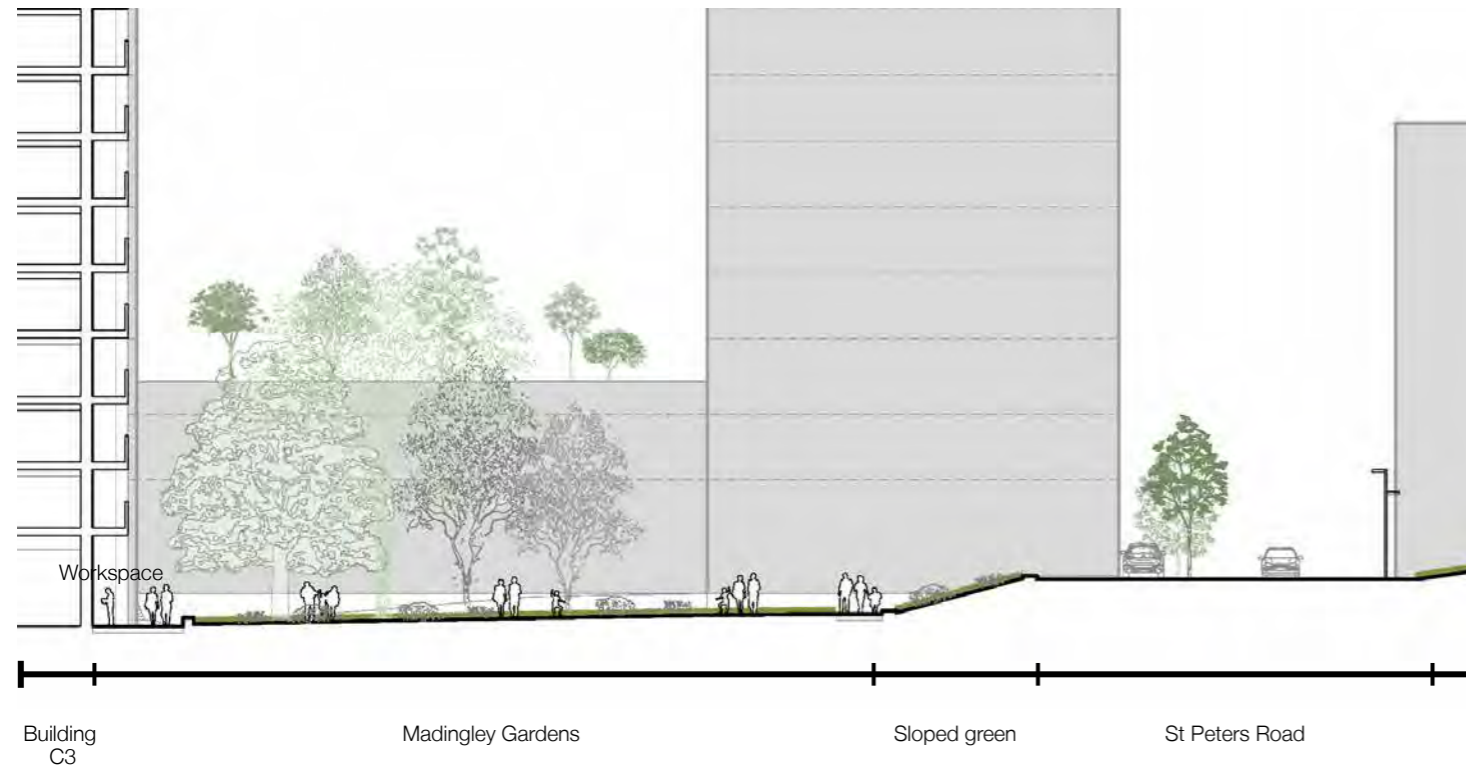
Section across Madingley Avenue and Madingley Gardens
